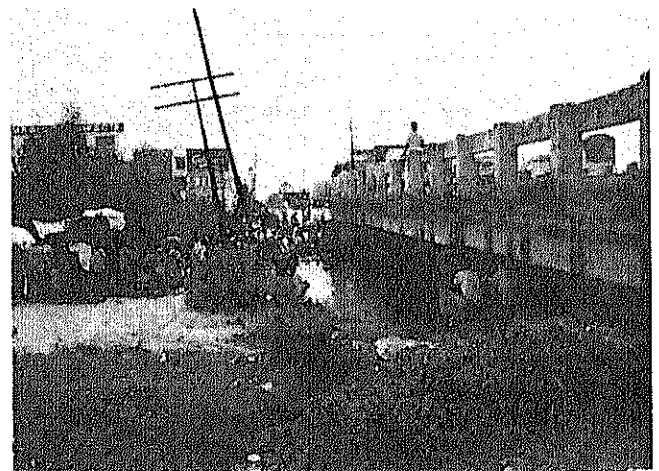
Magsaysay Bridge; passage is provided for pay by forming an emergency bridge using boats arranged side by side
